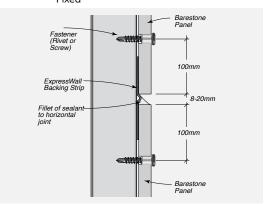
Horizontal Joint Detail with ExpressWall Backing Strip - Sealant Filled and Screw Fixed
